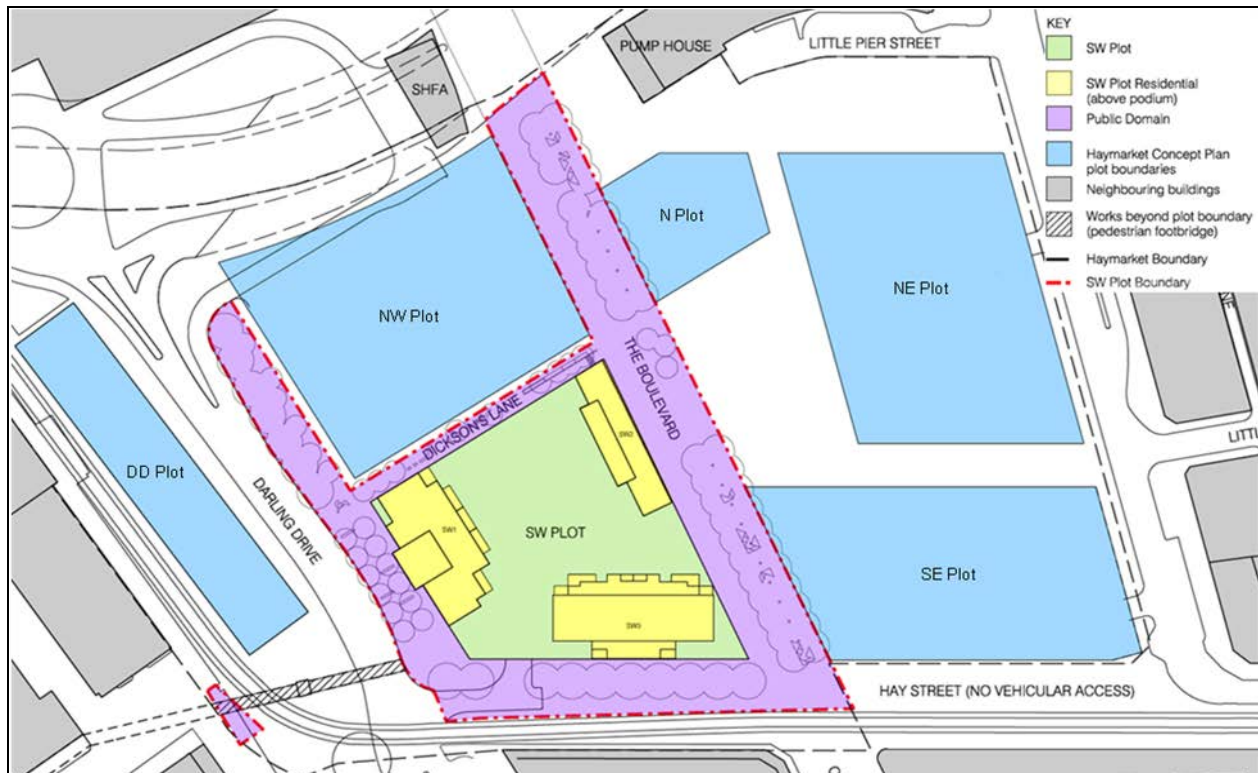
The Haymarket Plot layout and the detailed layout of the South West Plot (Source: applicant's EIS)
